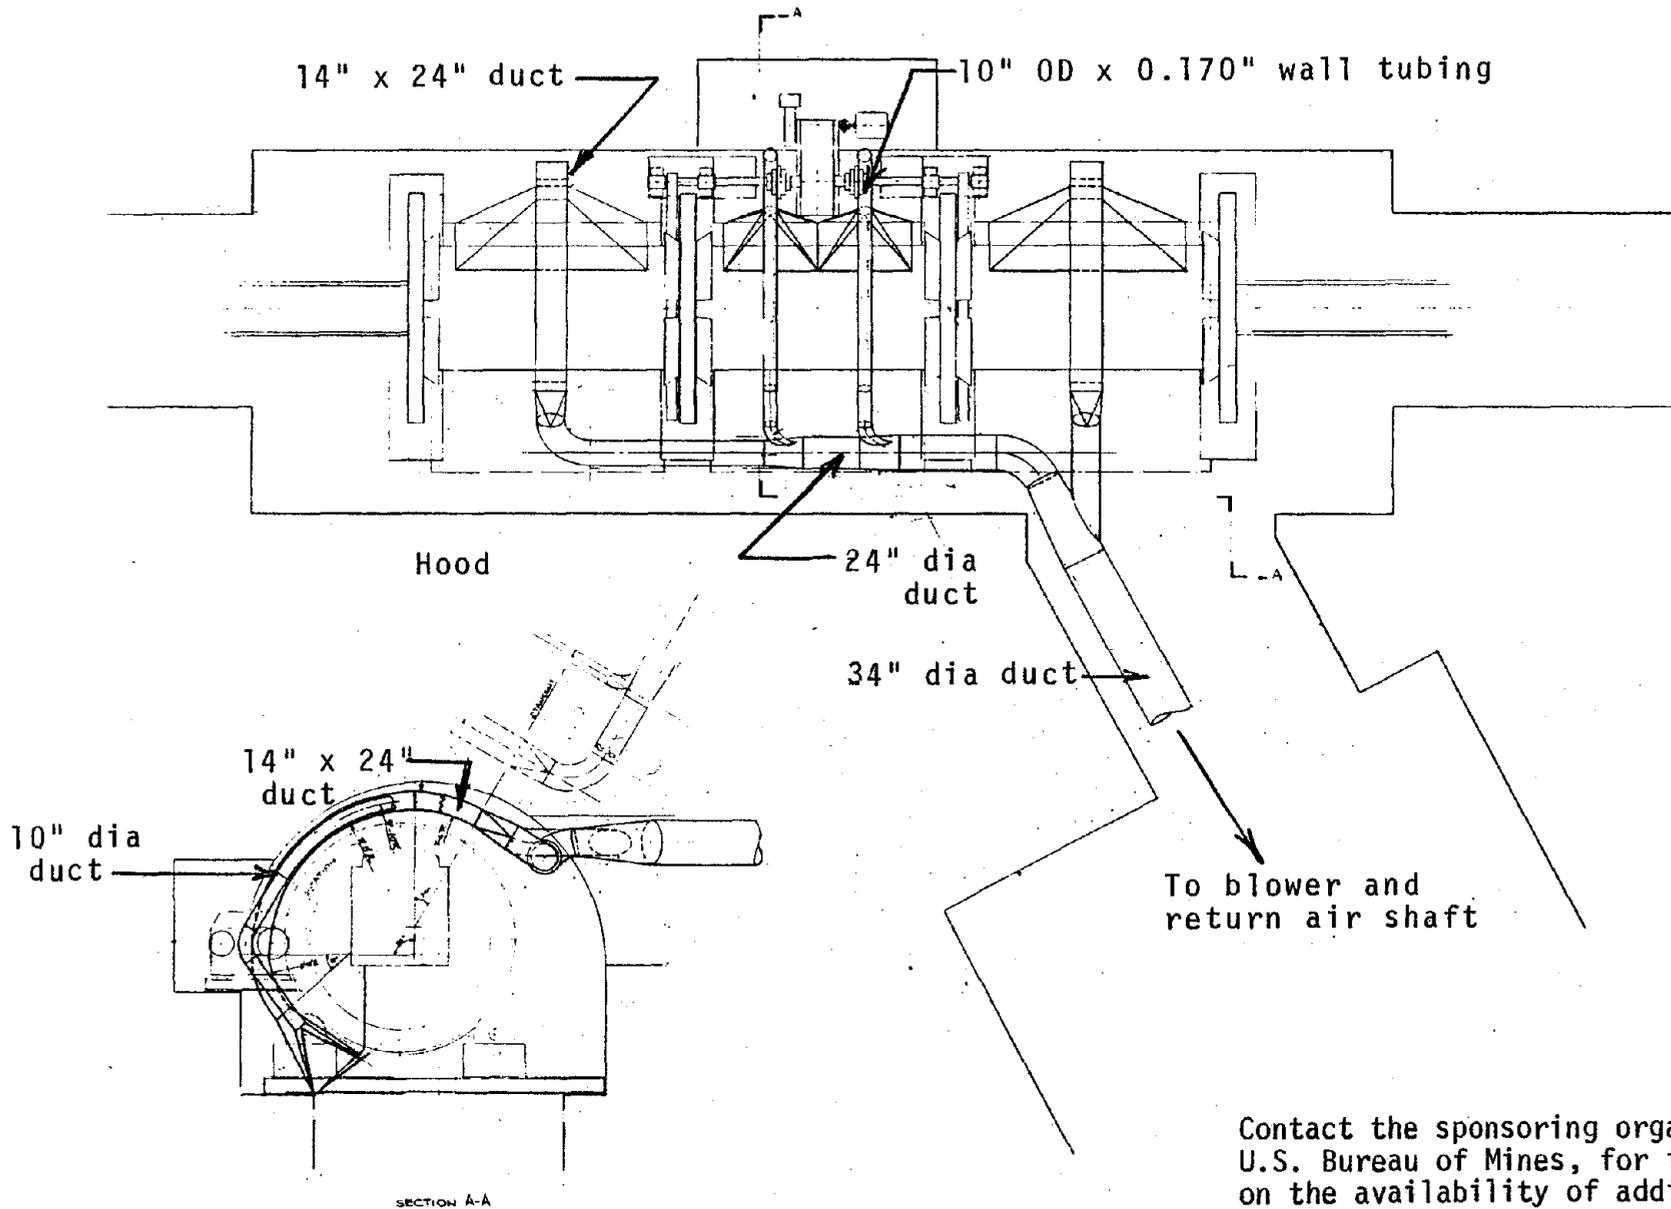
PROPOSED PLAN FOR EXHAUSTING DUST FROM THE ROTARY DUMP
